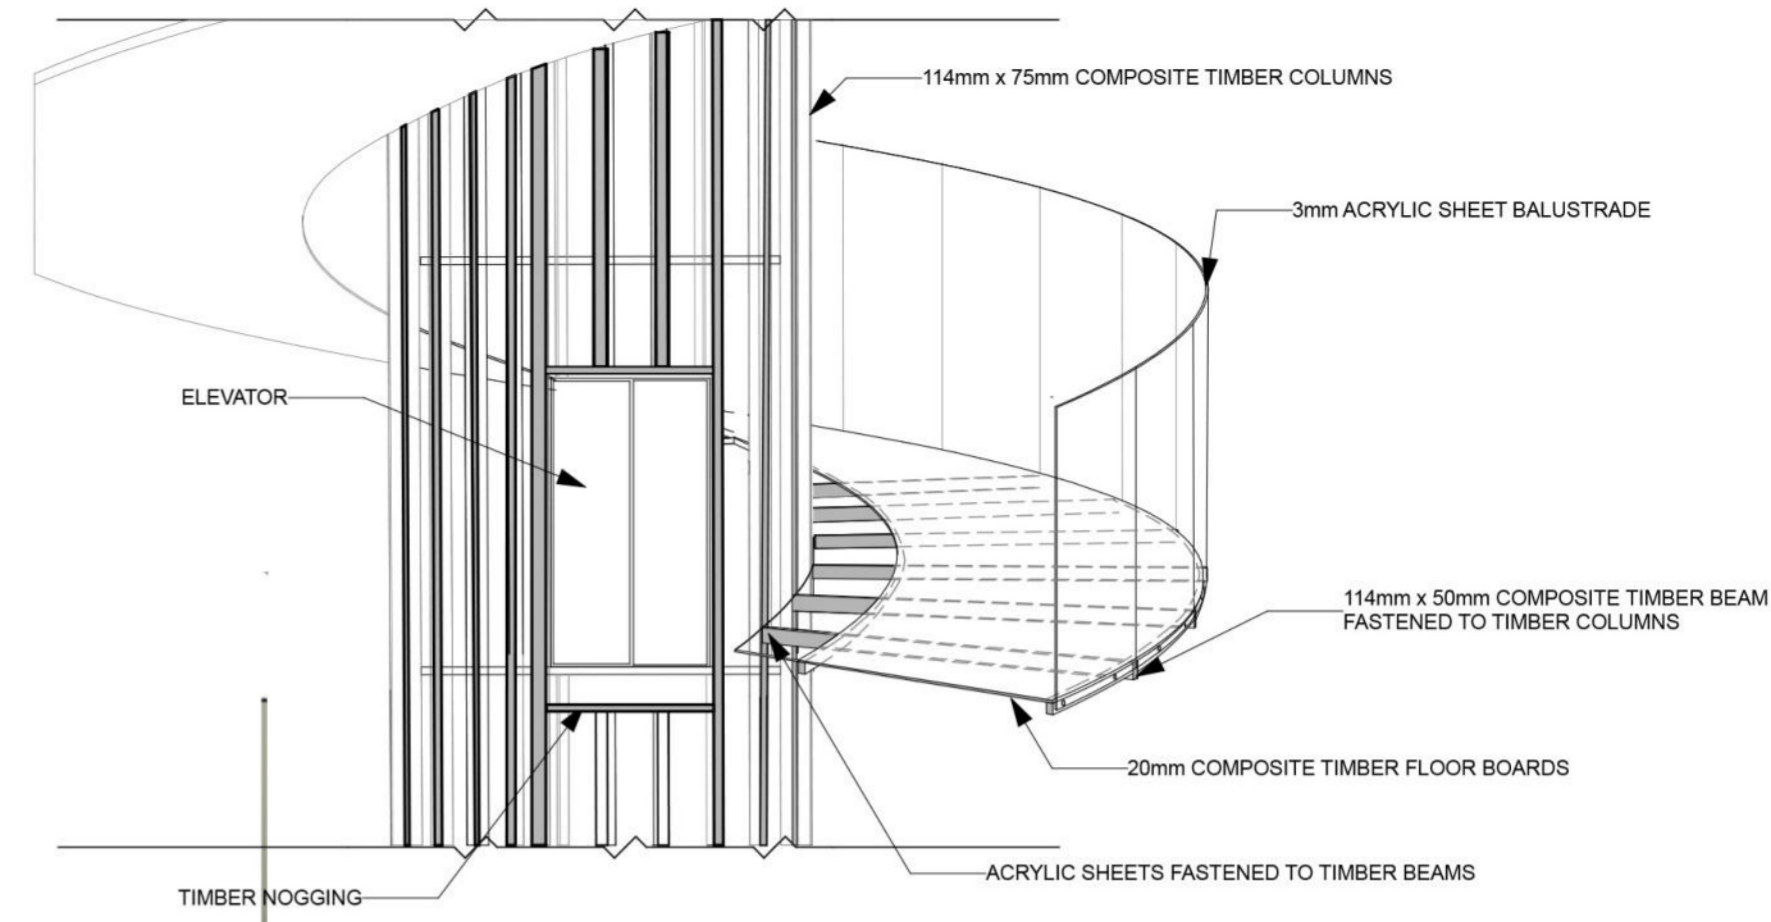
CONSTRUCTION DRAWING OF RAMP & ELEVATOR
